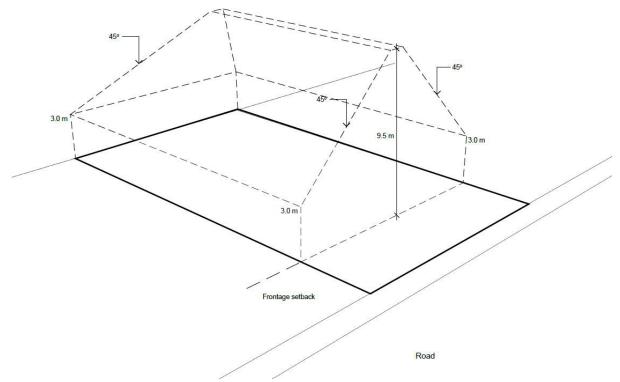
Building envelope as required by clause 11.4.2 A3(a)
